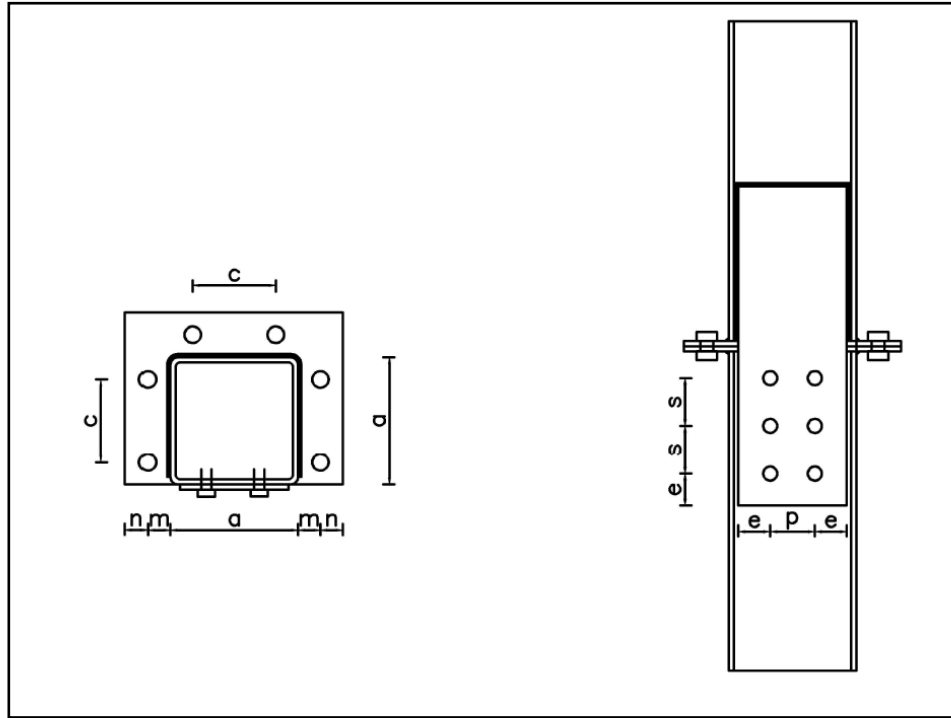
Plan and elevation of non-symmetrical intermediate splice connection
